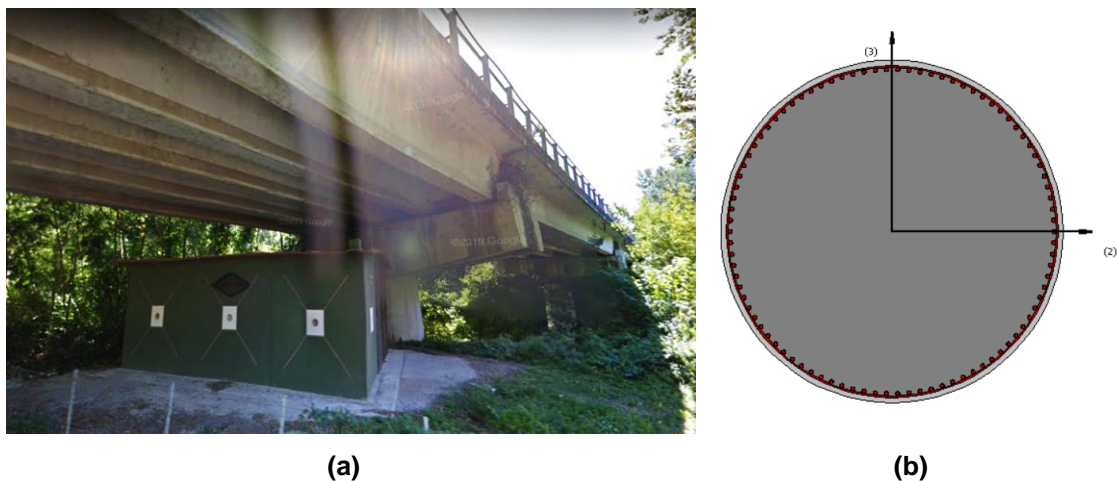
(a) Photo of a portion of the bridge and (b) cross-section view of a pier.
